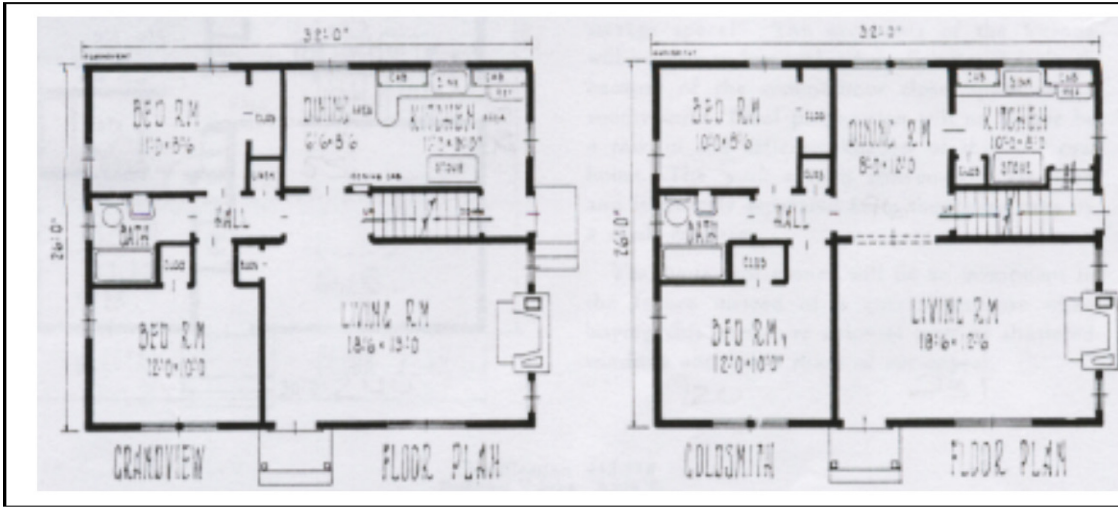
Exhibit D: Home Plan Book Company. "The Book of Well Planned Homes: Designs and Floor Plans for 47 Well Planned Homes." St. Paul: Home Plan Book Co., 1953 (19)
